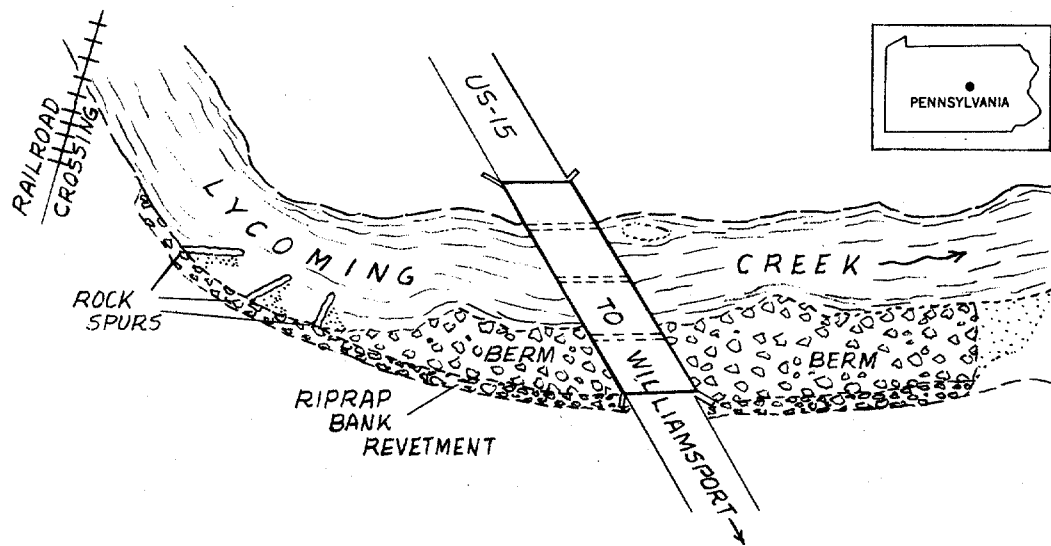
Plan sketch of countermeasures at US-15 crossing, Lycoming Creek.
